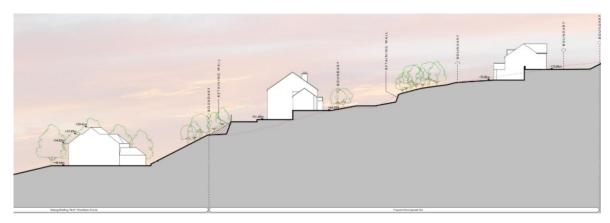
Proposed Section DD – Relationship between Site 26 (House Type J) and No. 1 Woodlands Avenue
